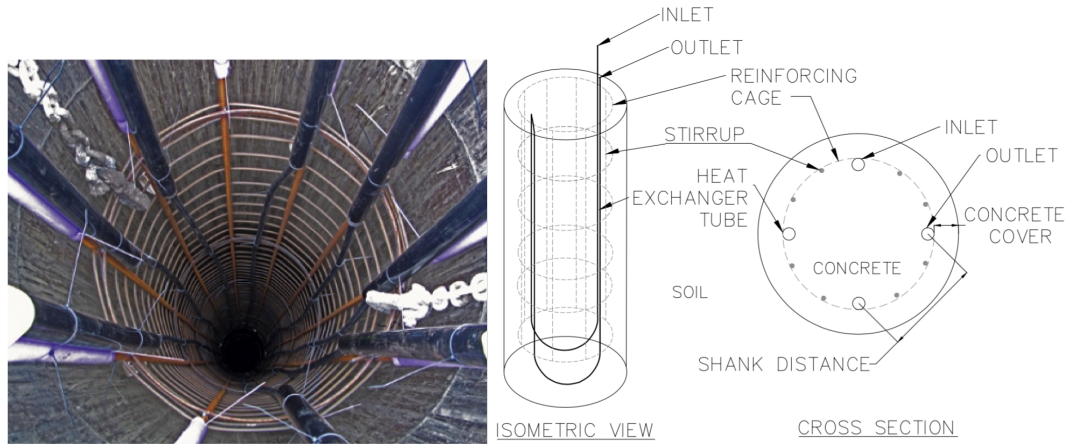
Image and sketch showing heat exchanger pipes embedded in concrete energy piles with geometry details relevant to thermal performance
